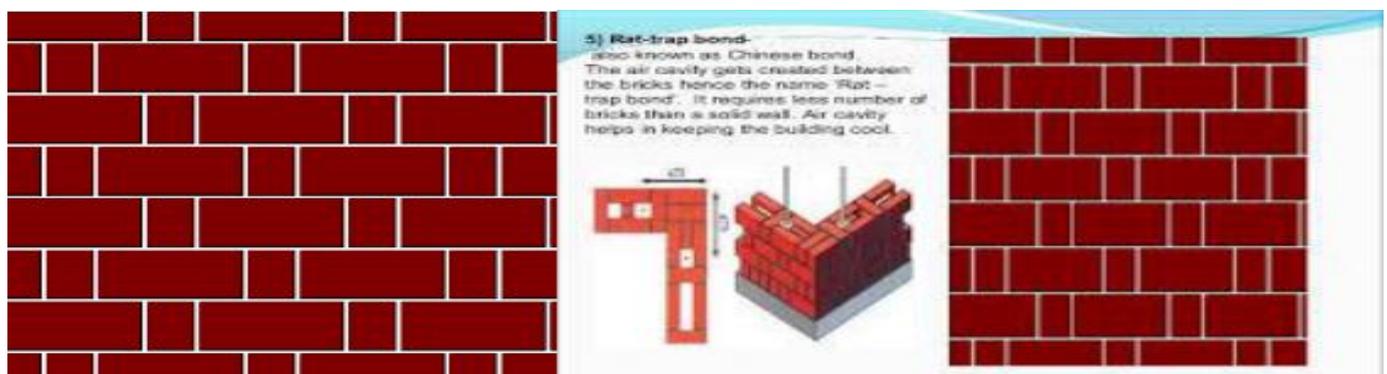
The Elevation and bonding structure of Rat Trap bond Masonry
